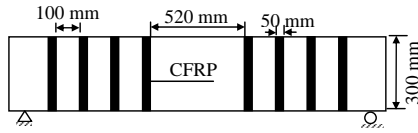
The arrangement of the CFRP laminate in retrofitted beams.
